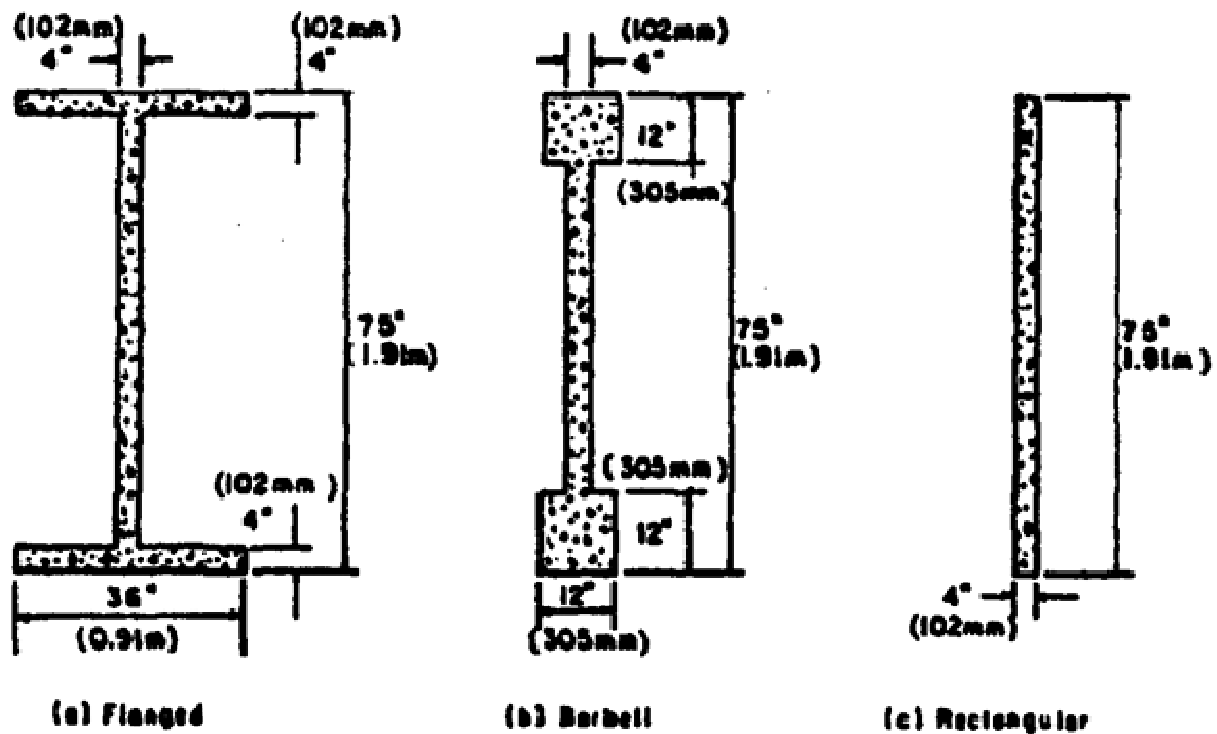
Wall sections tested by Oesterle et al. (1979)
